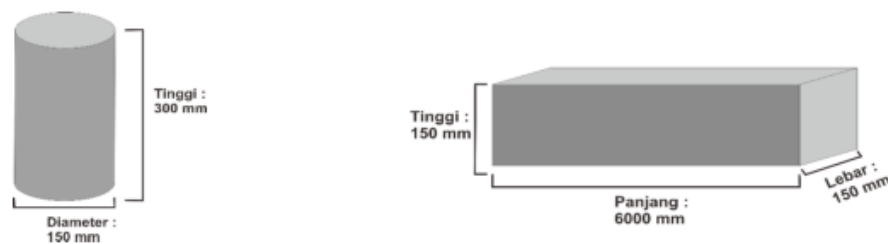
Concrete mold dimensions and their dimensions (Cylinder and Beam)
